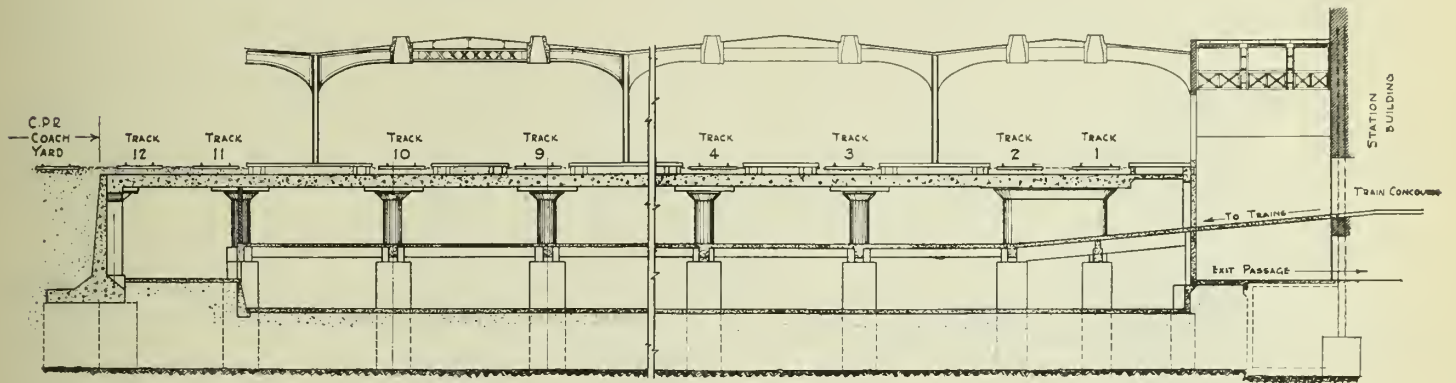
Cross-section through Station showing Connection with Viaduct Structure.
